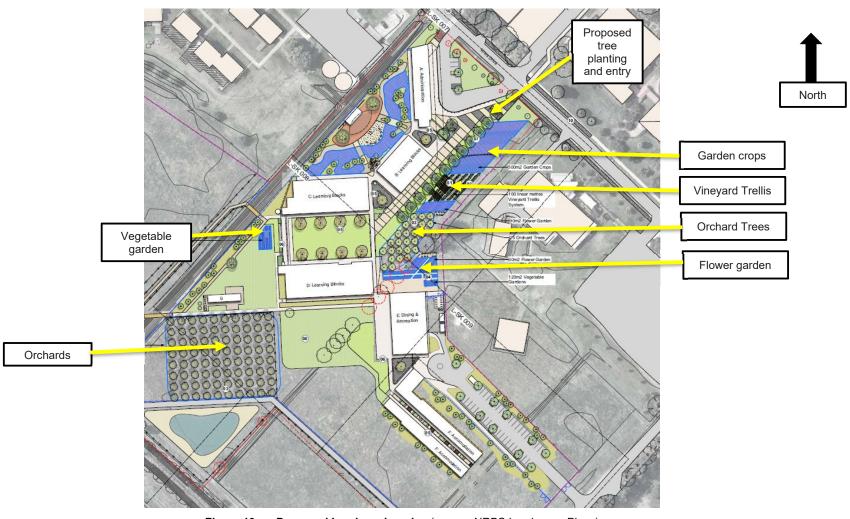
Proposed Landscaping plan (source: NRBS Landscape Plans)
